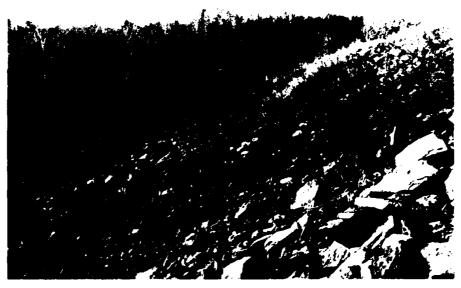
Downstream slope of dam viewed from about midheight, adjacent to right training wall of spillway.
